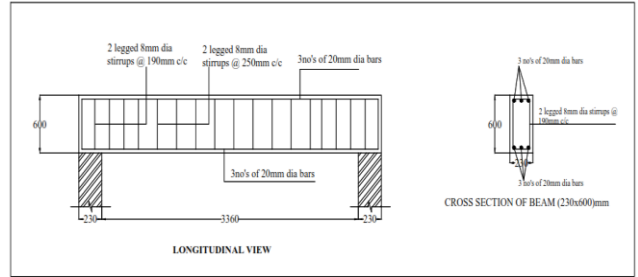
Detailing of Beam under floating Column (230x 600) mm
